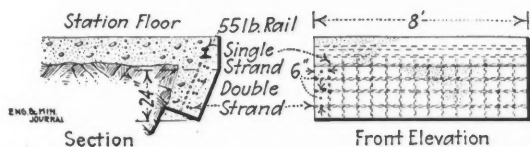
CONCRETE STATION BROW REINFORCED WITH 55-LB. RAIL
